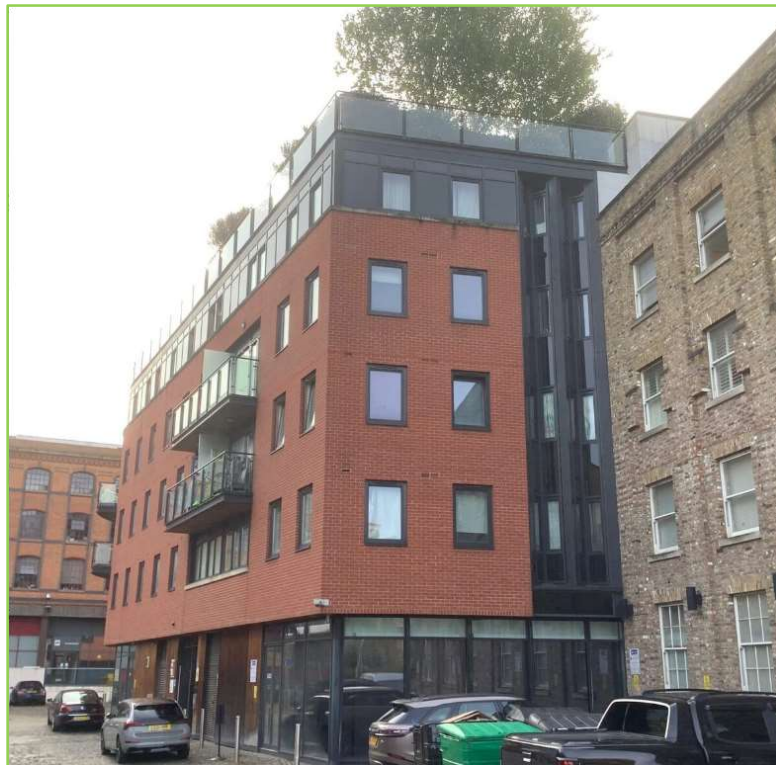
North Elevation showing new masonry extension and aluminium cladding.
